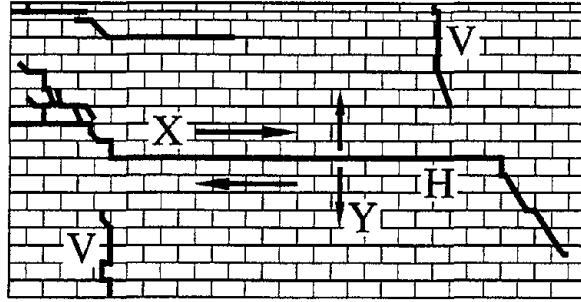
Dilation of cracks in masonry infill walls.
